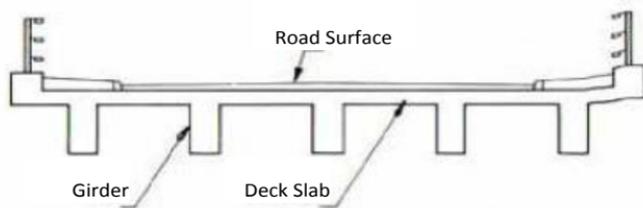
Reinforced Concrete Slab Bridge
